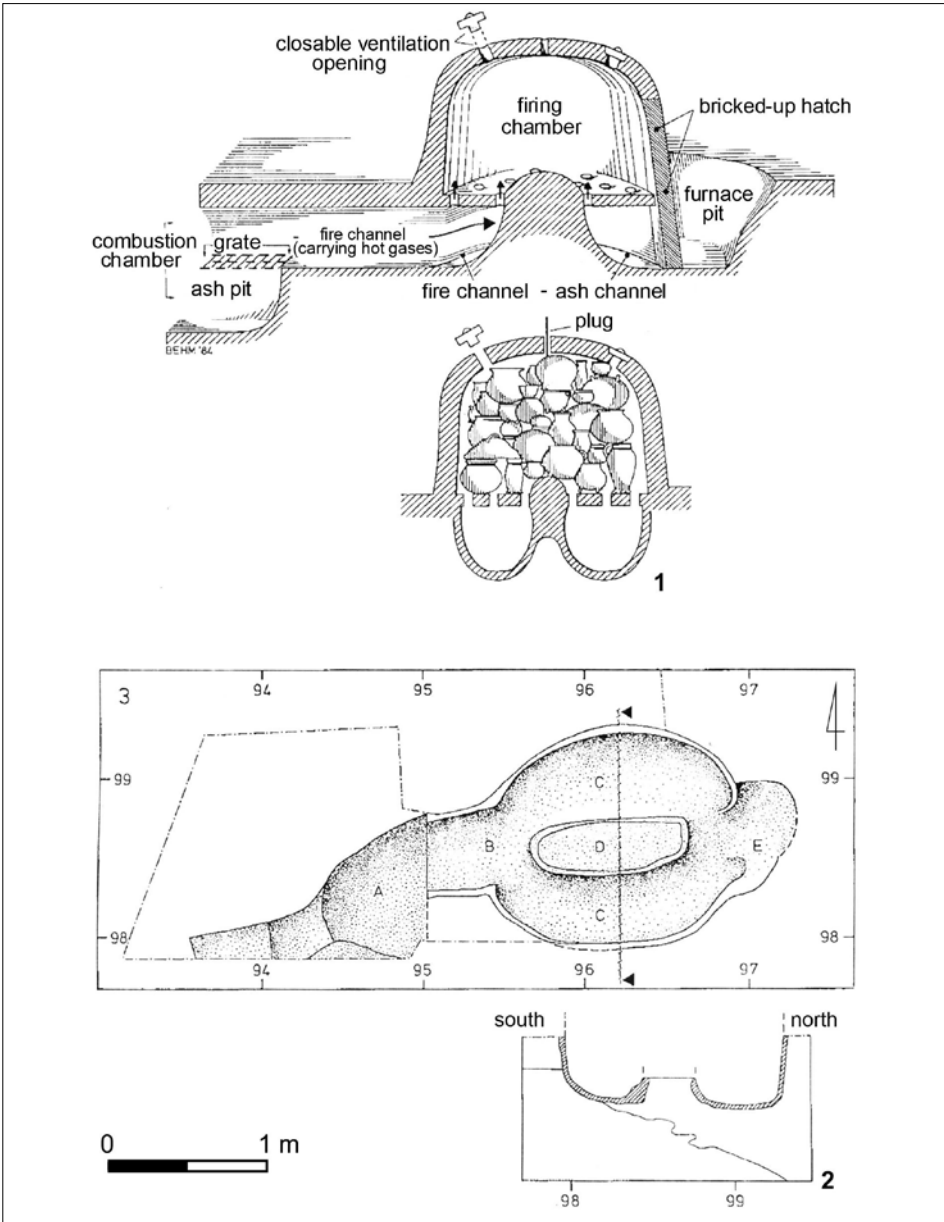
Lübeck, Koberg 15-16. 1 - reconstruction of pottery kiln, 2 - plan and cross-section of the kiln (after Buchin, Erdmann 1986, Fig. 1)
